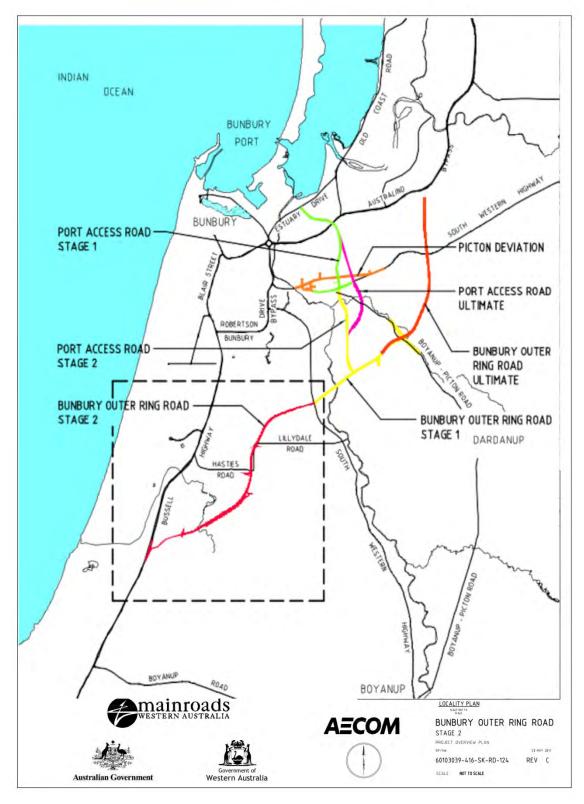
Location Plan: Bunbury Outer Ring Road (Southern Section) Project Area.
